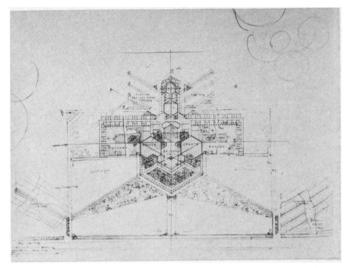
Arizona State Capitol Pioject, Phoenix, Ariz. Groundfloor plan. 1957.
